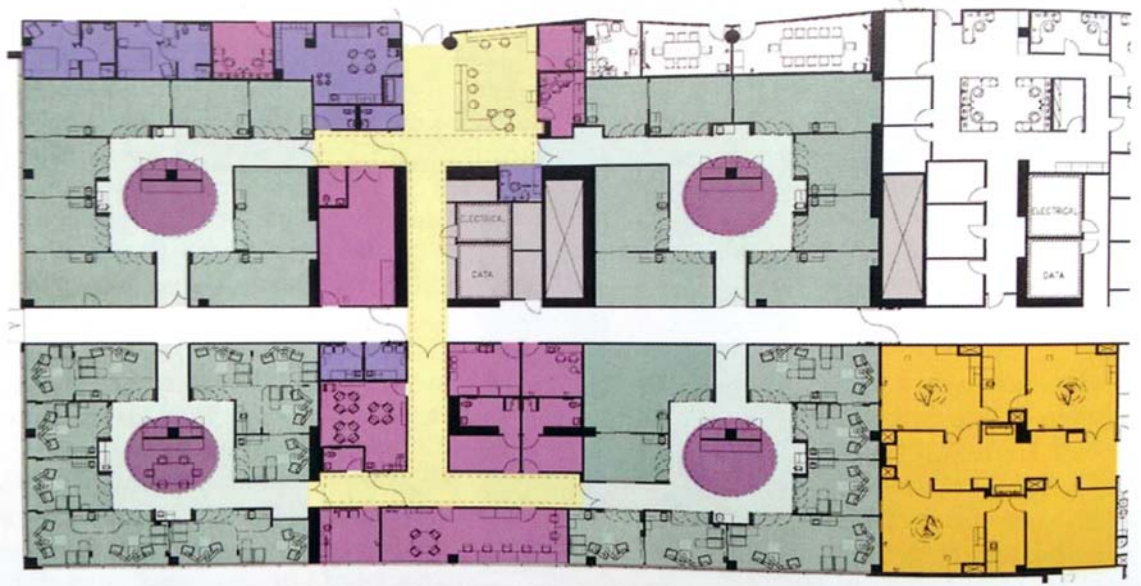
Pod/Cluster design floor plan (Source: Shepley, 2014, p. 100)
